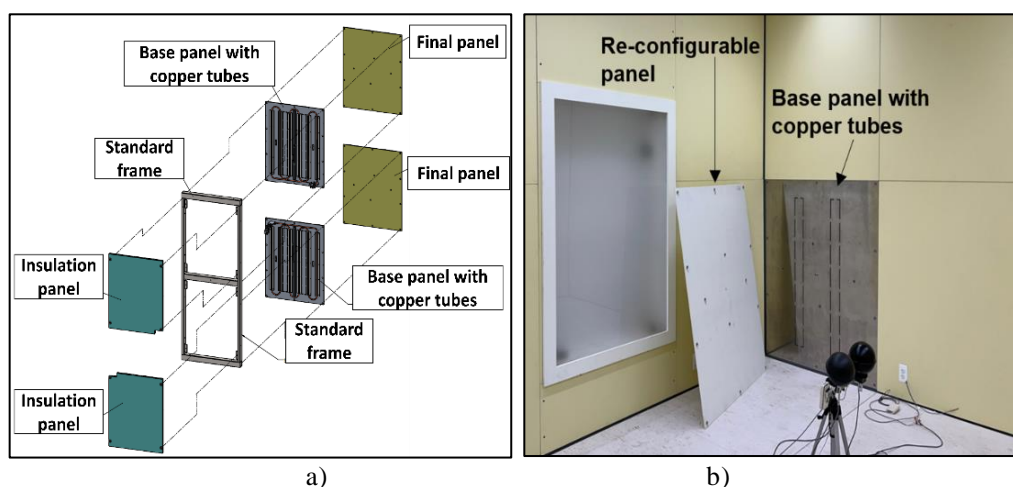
(a) Panel exploded-view; (b) Panel final build.
